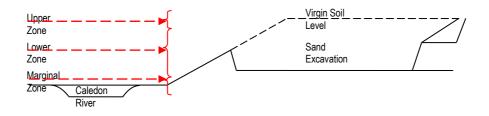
Simplified representation of the excavation of sand from bench cuts and levelling of resultant excavation. An irregular surface topography should be avoided as far as possible.
